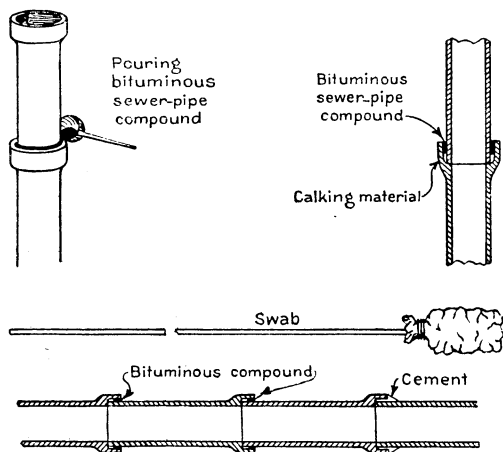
Method of assembling vitrified sewer-pipe unit
